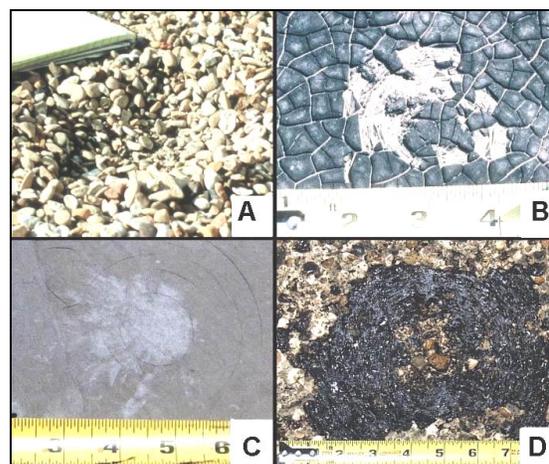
Hail impacts on built-up roofs: a) divot in loose gravel (no damage), b) spalling of the asphalt flood coat, c) concentric fractures in coating associated with a spatter mark, and d) "doughnut-shaped" area of spalled asphalt flood coat with large impact.
